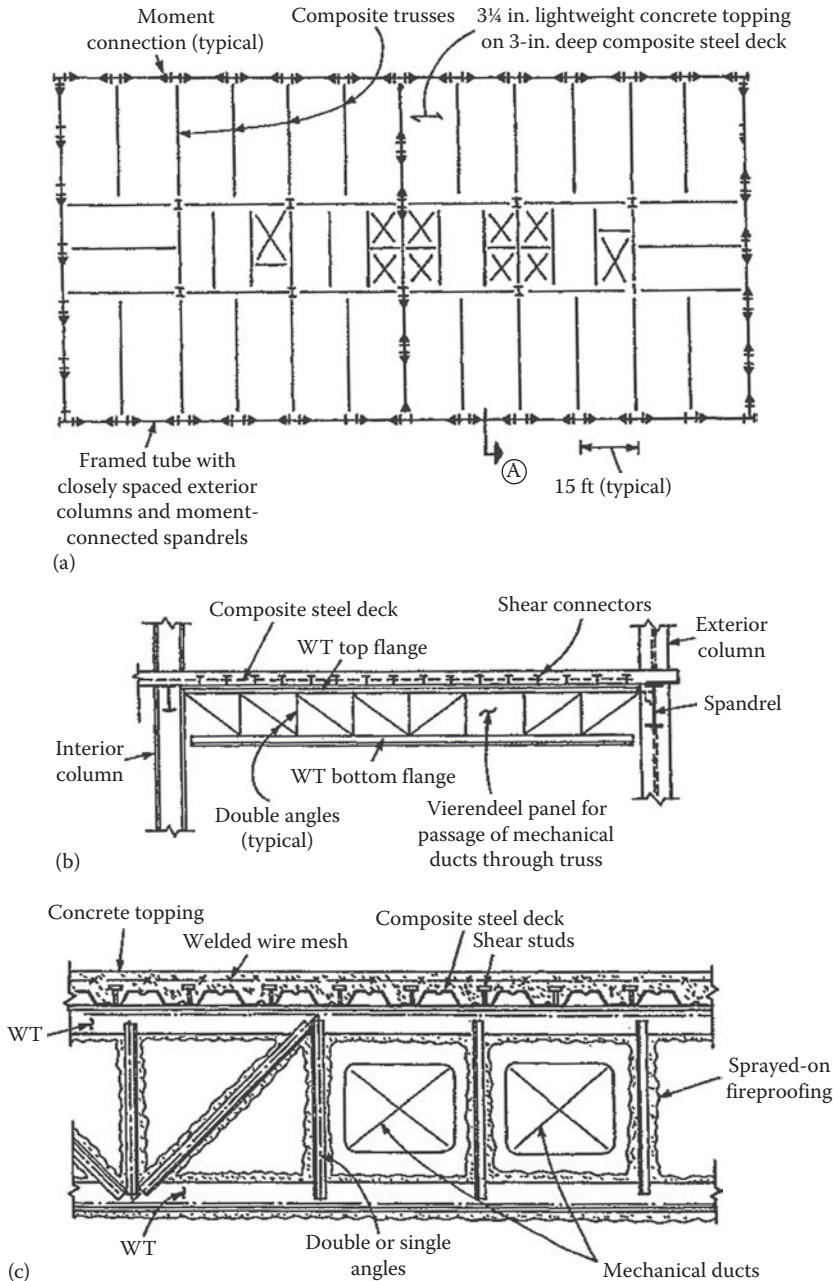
Composite truss: (a) floor framing plan; (b) section A; (c) Vierendeel panels.
